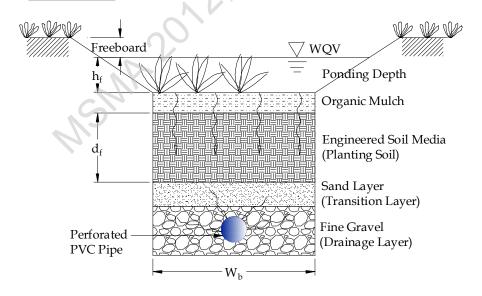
Hydraulic Variables for Subsoil Drainage
